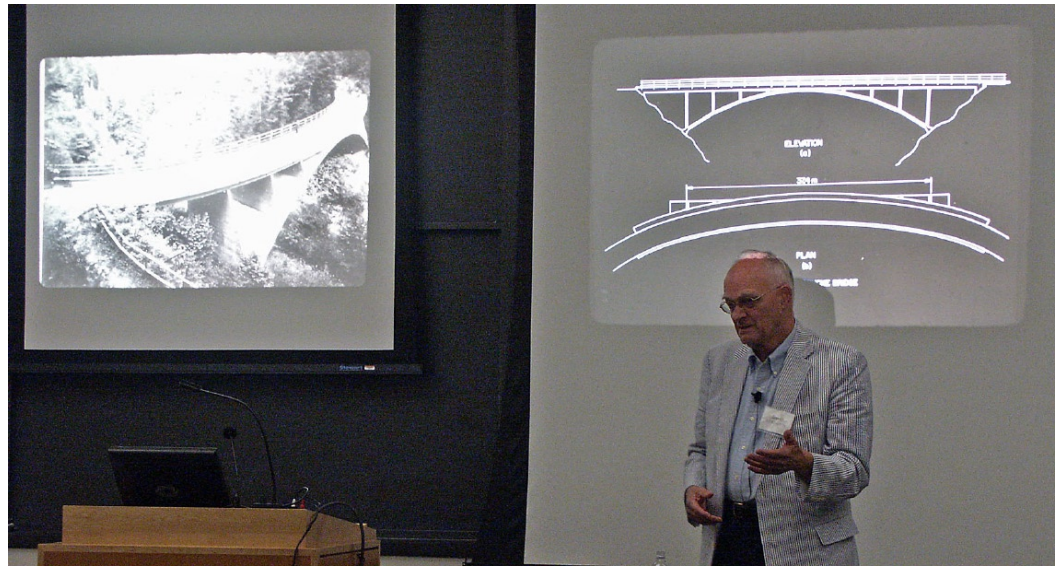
Photo of Schwandbach at left, profile and plan at right
